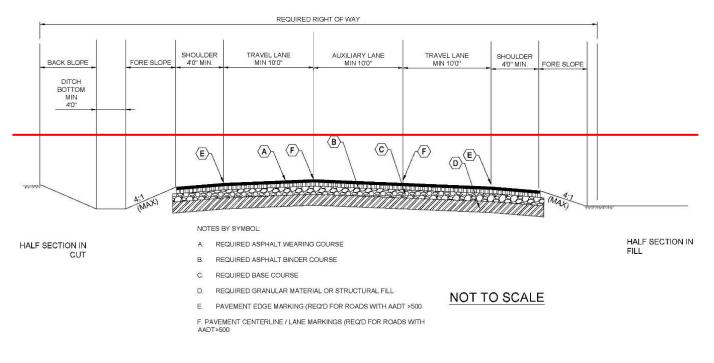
Cross Section Elements and Requirements for Uncurbed Roadway, 2-Lane, Asphalt Concrete Pavement
